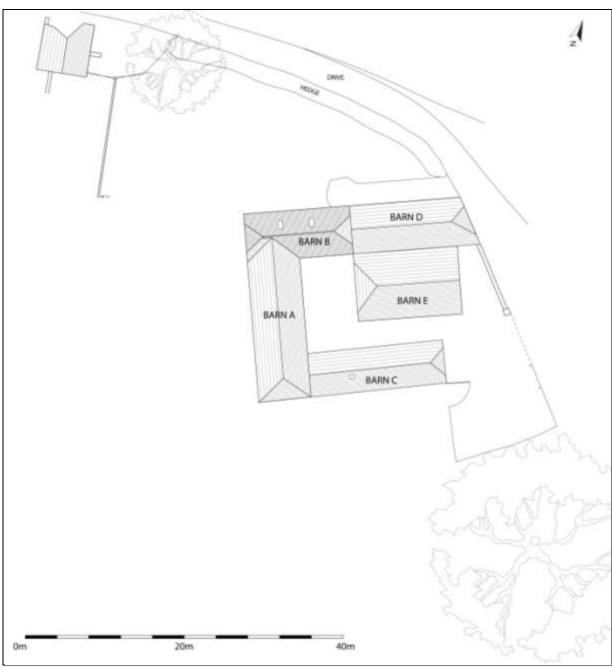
SITE PLAN, SHOWING THE FIVE BARNS SUBJECT TO THIS REPORT.
